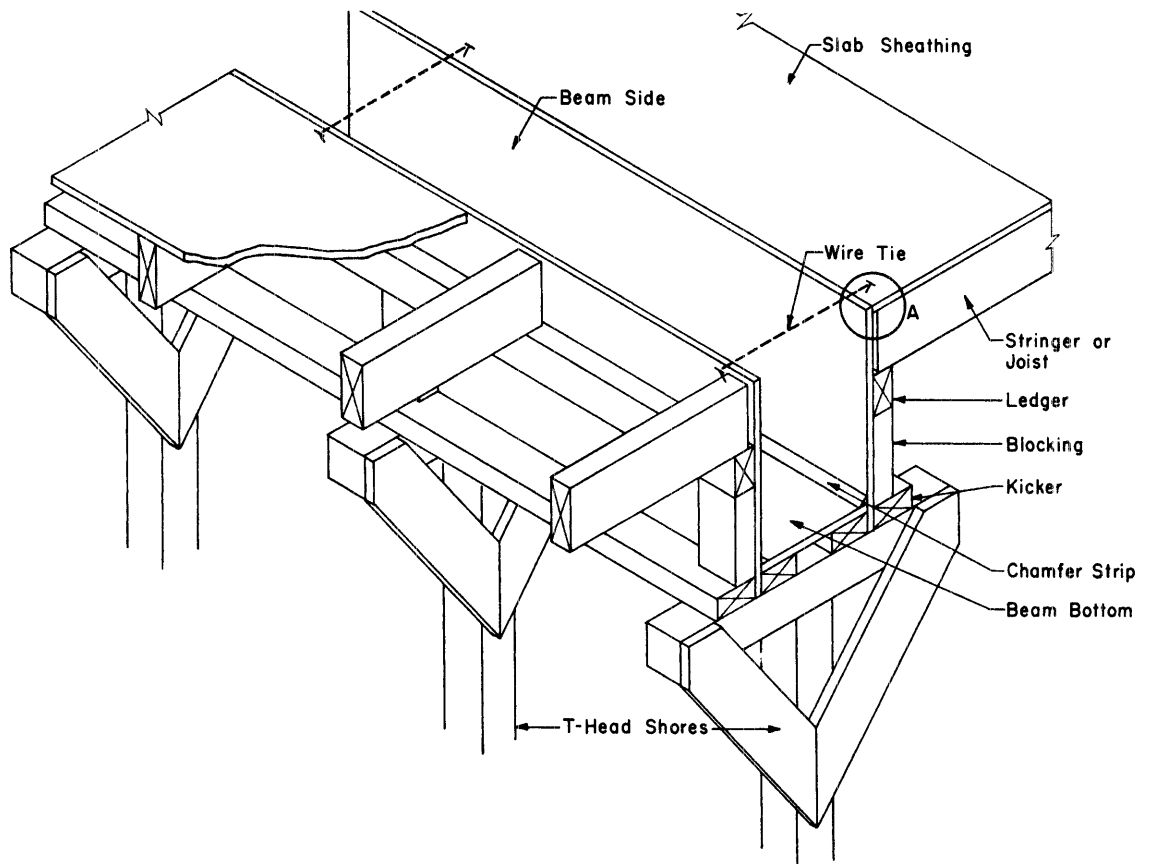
Beam and slab form. (Courtesy of American Concrete Institute)
